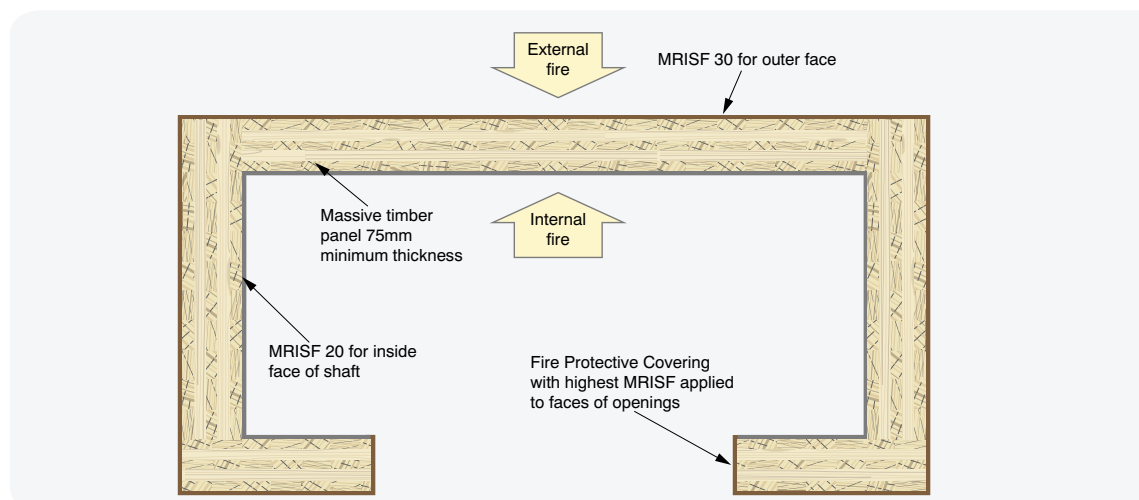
MRISF requirements for typical stair and lift shaft construction for single skin massive timber panel construction.
